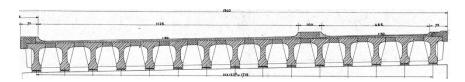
Cross-section of Vecht Bridge (measurements in cm).
